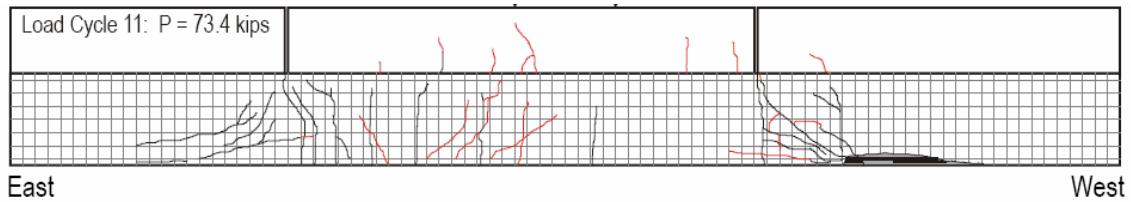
Shear Flexure Cracking at Barrier Open Deflection Joint¹
